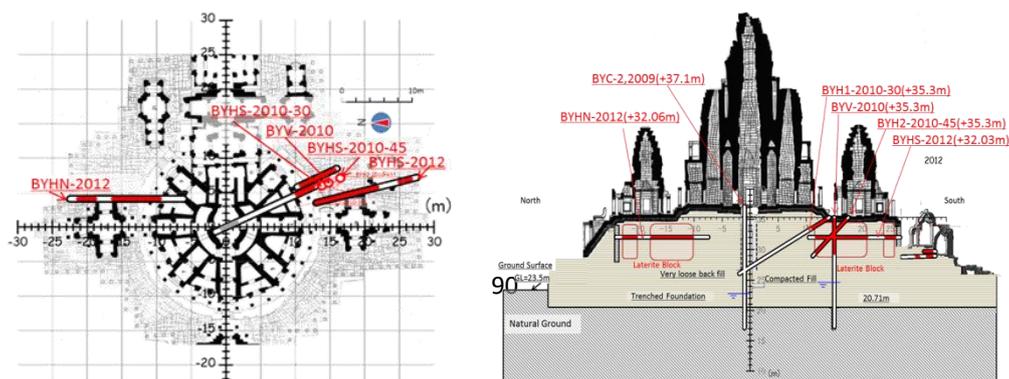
Boring points for the foundation mound of main tower of Bayon temple (plan and section)
